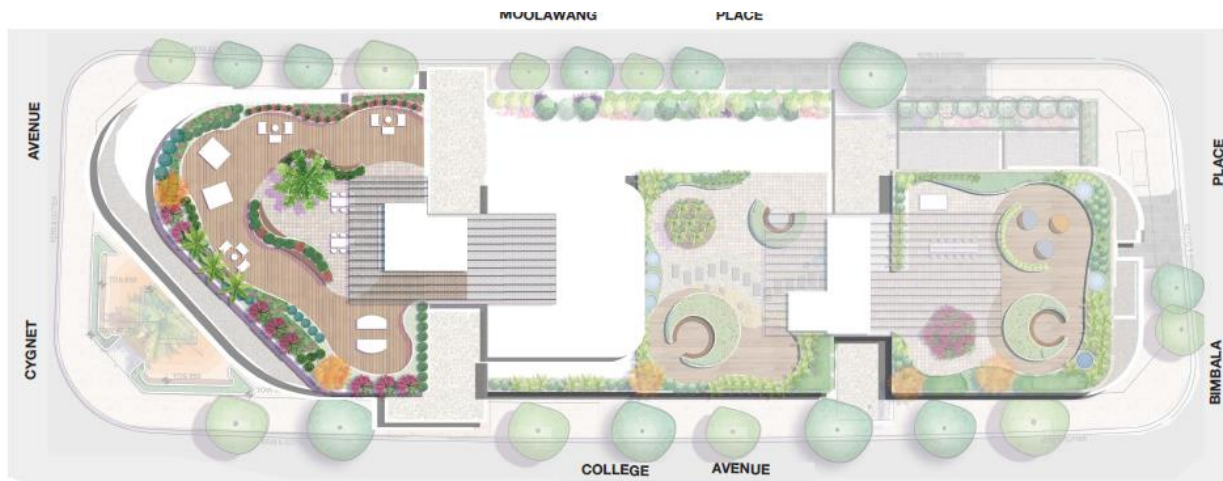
Extract of proposed overall plan of landscaping (Source: Taylor Brammer)
